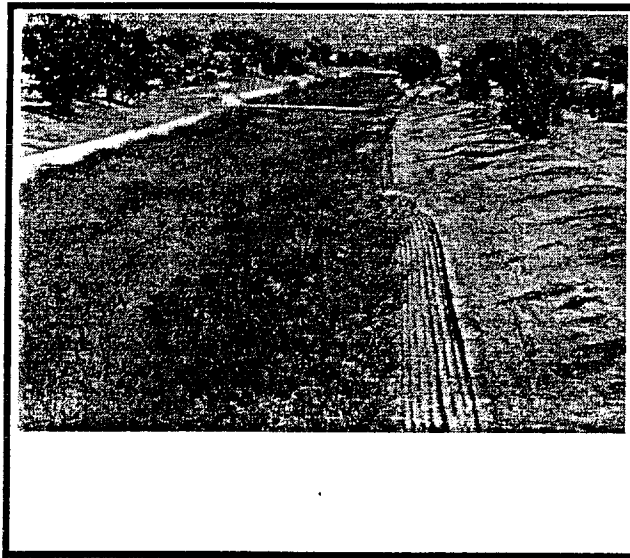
Soil cement bank protection, Sand Creek, Colorado
